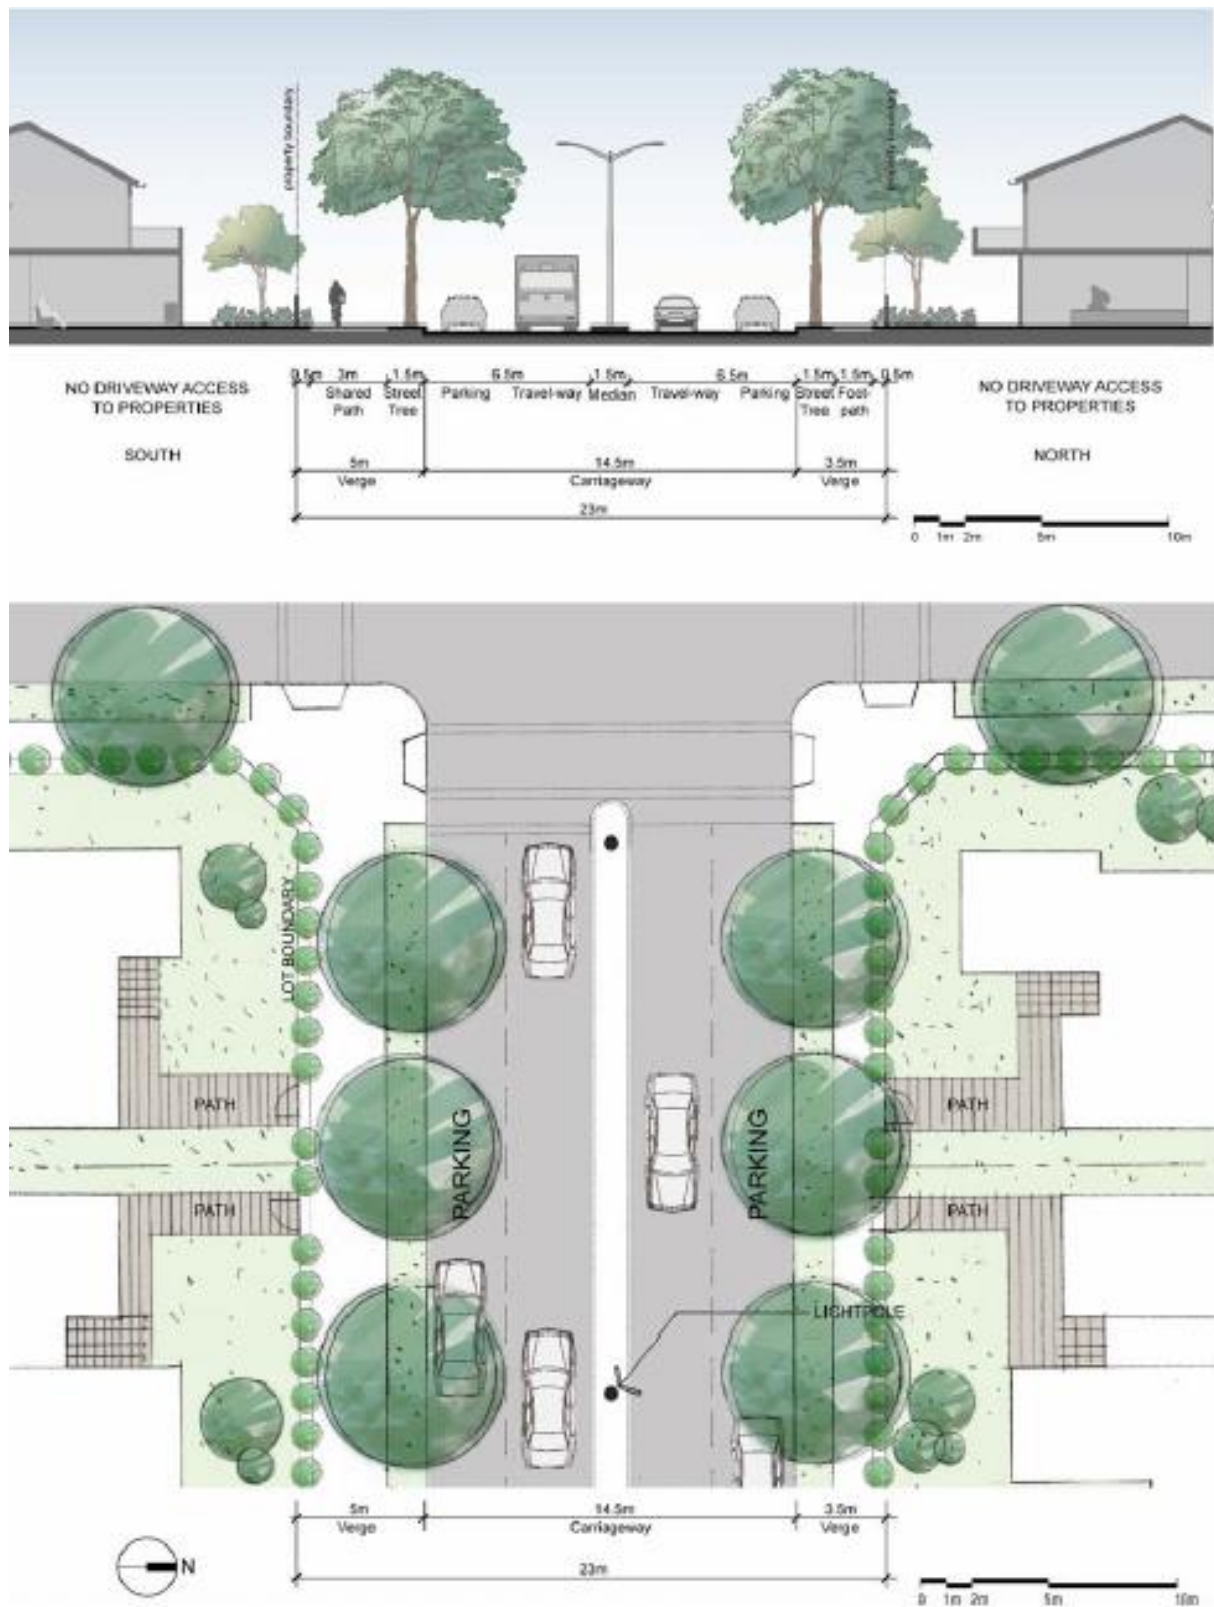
Sub Arterial Road B - Withers Road (From Barry Road to Smalls Creek or Mungerie Road)
